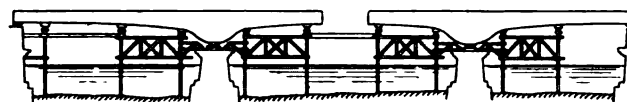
Cantilever Bridge over the Seine at Paris.
